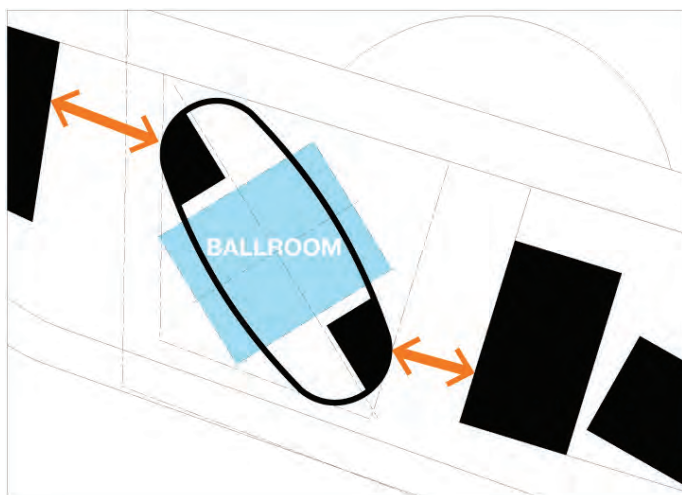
Four Seasons, Delhi: Plan diagram illustrating the tower's relationship to adjacent buildings. (Source: Woods Bagot)
